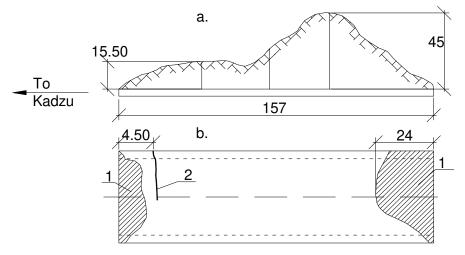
The destruction of the portico of a railway tunnel at the Kanto earthquake: a-profile in the long, b-damage to the vault, 1-crashes, 2-cracks.
